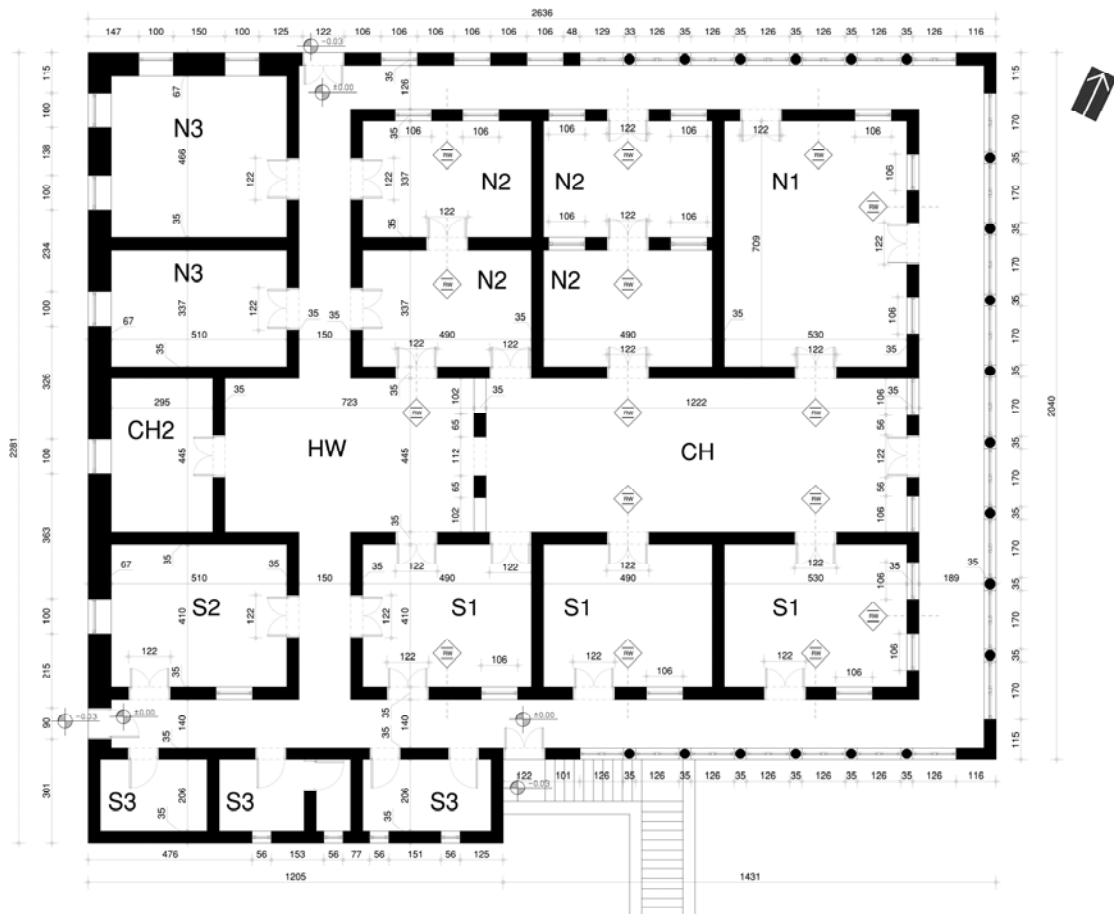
living floor plan of the house at 19 Ma'ale Ha-Shihzur Street, Tel-Aviv-Jaffa (redrawn by the author based on existing documentation)
